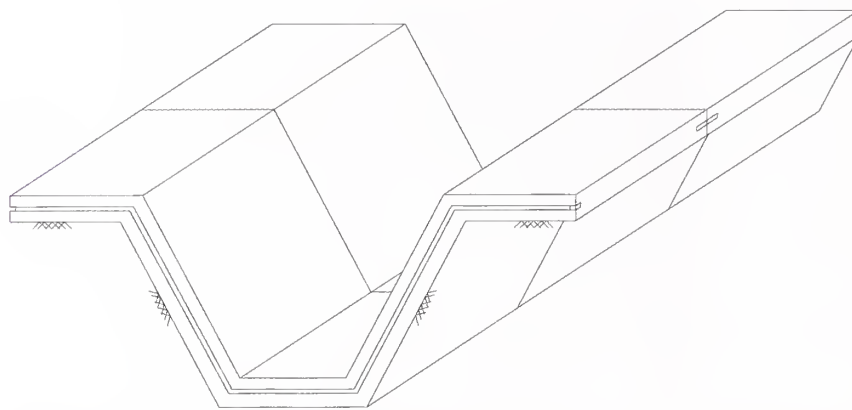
A Schematic View of a Precast Concrete Drain
